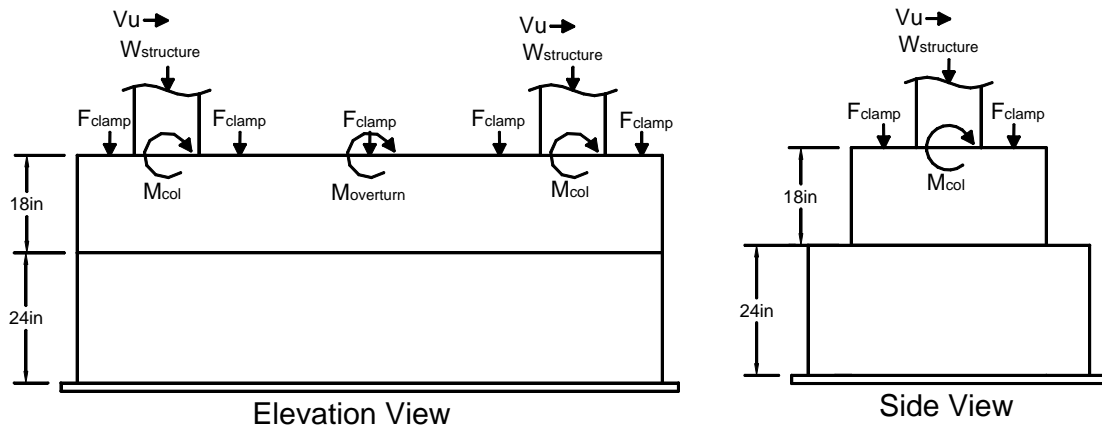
Forces used to calculate design loads for footing of bent 1.
